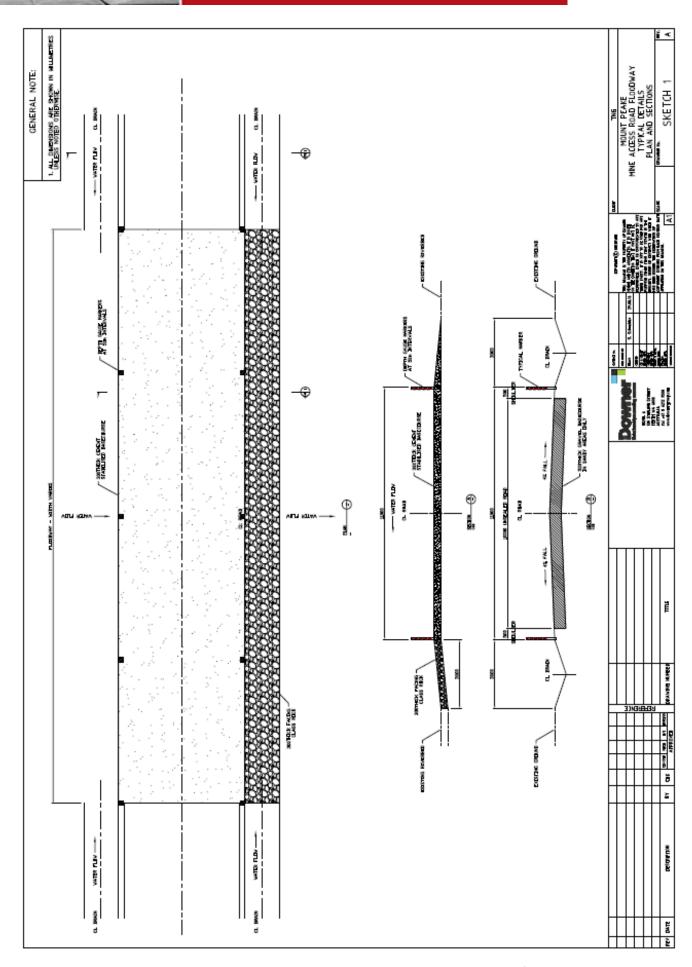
River crossing causeway design diagram, showing sectional and plan view of the proposed crossings on both the Hanson River and Murray Creek.
